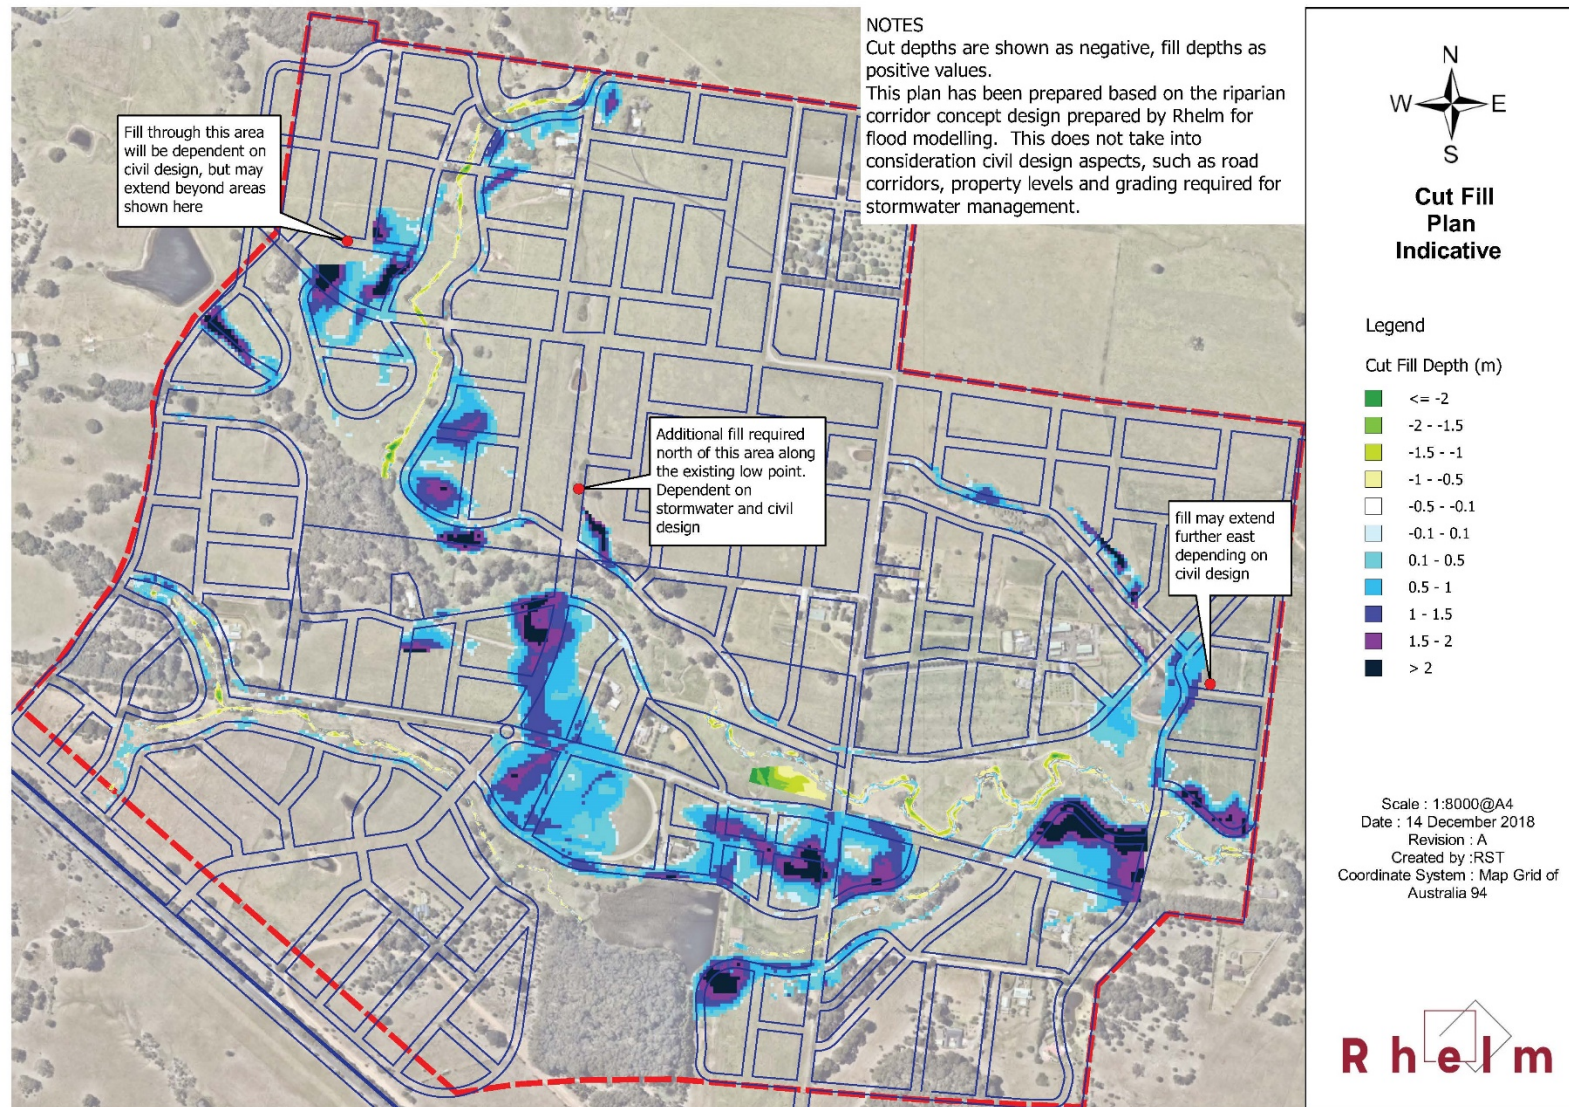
Fill Plan to Attain Building Platforms for Development Above the Flood Planning Level
